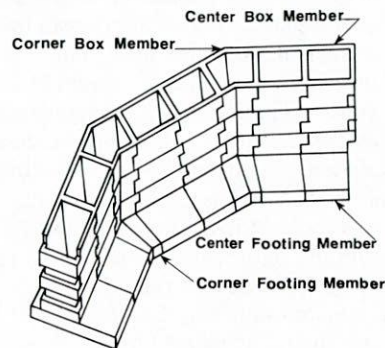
B Abutment With Precast Concrete Box Members (After GangaRao Ref.2)
